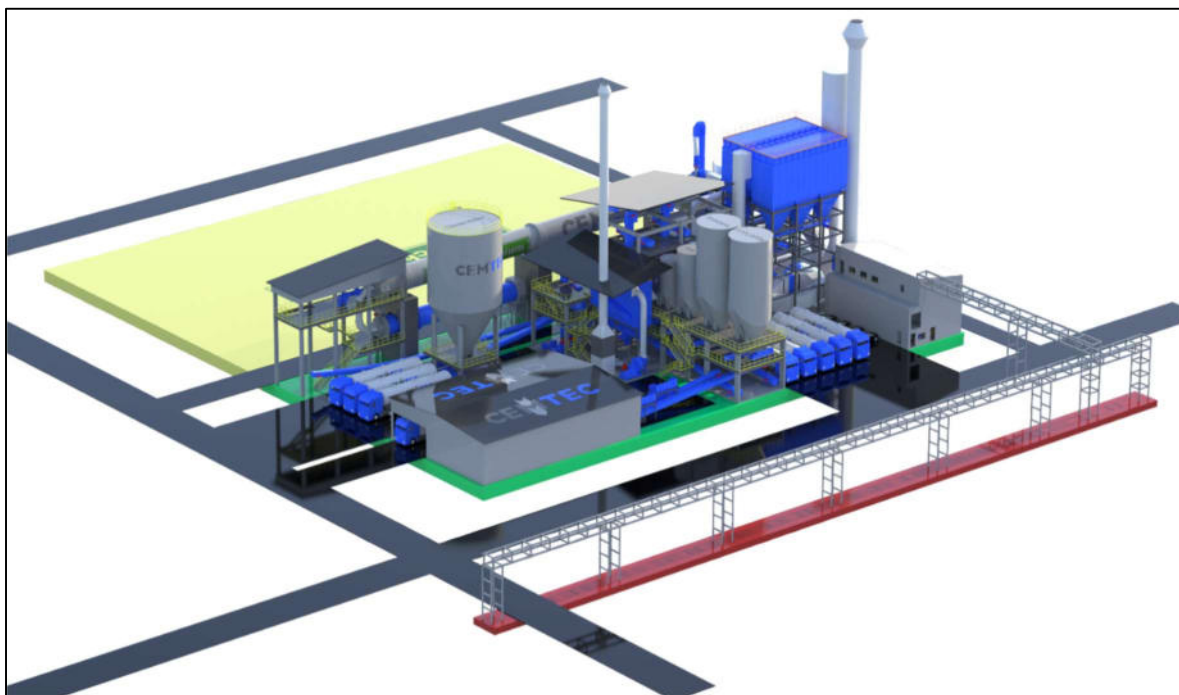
Layout of the roasting plant (View North to South with open buildings) [208]
